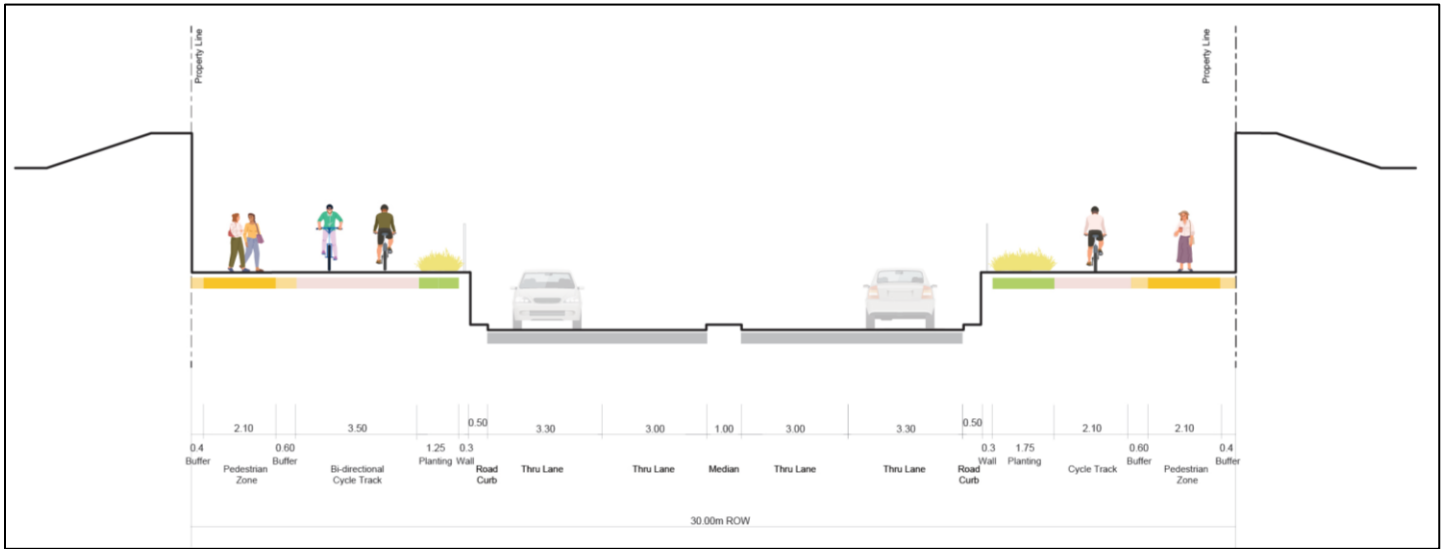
Northern Street (Underpass – Open to Sky) Cross-Section – Option 1
